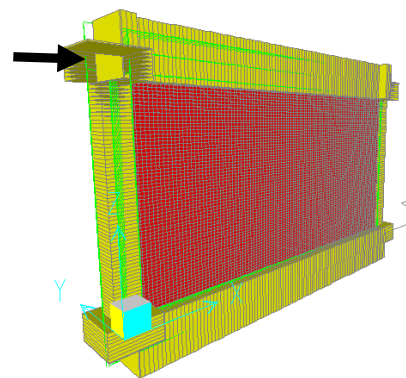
The studied single-storey one bay R/C frame with the encased R/C panel
